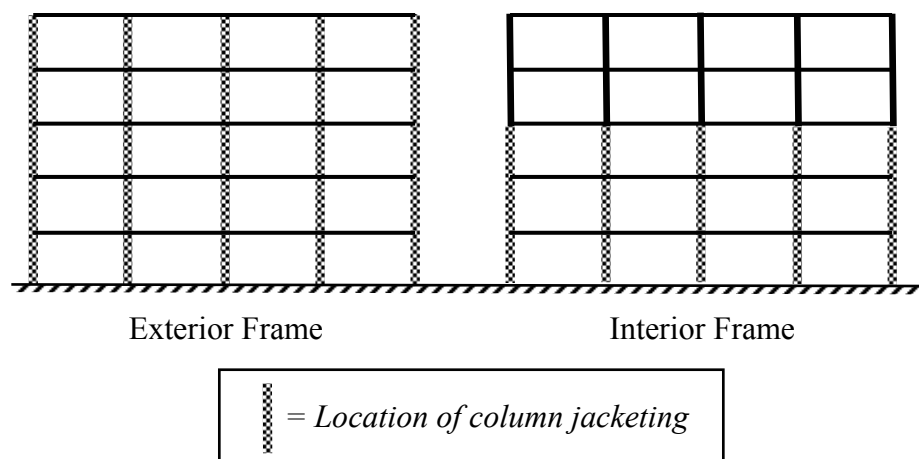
Retrofit 2: Addition of RC column jackets
